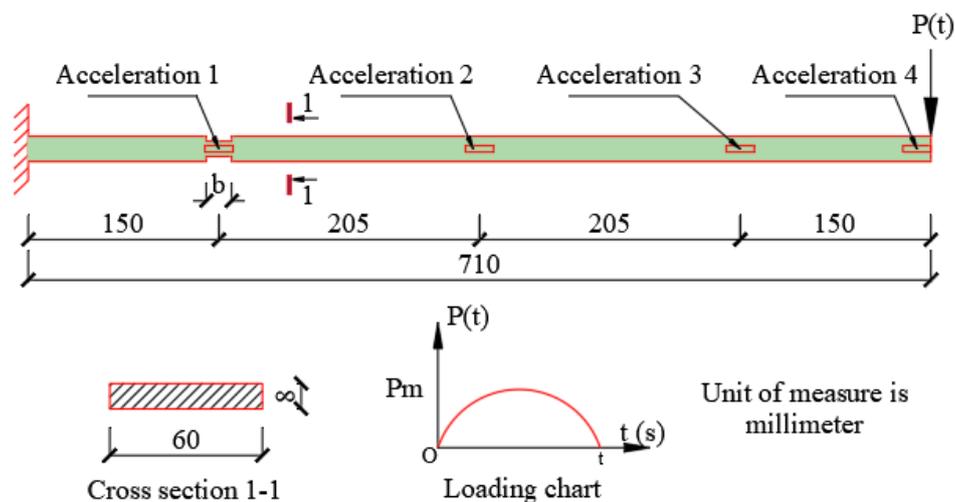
Structural diagram of damage located at 1/4 of the span length.
